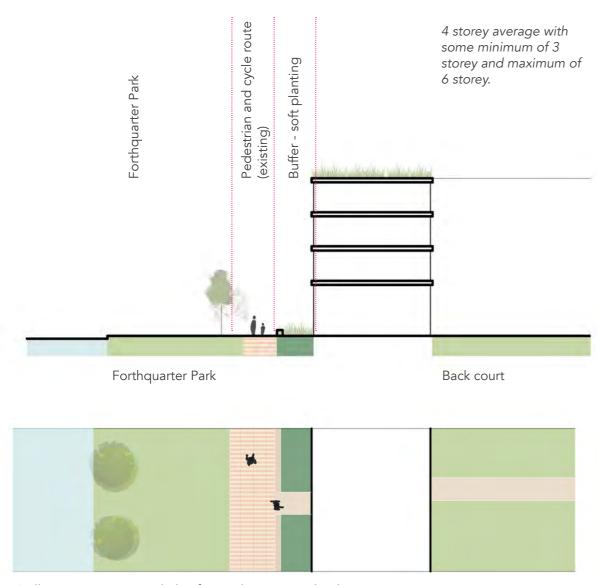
Illustrative section and plan for Forthquarter Park edge
